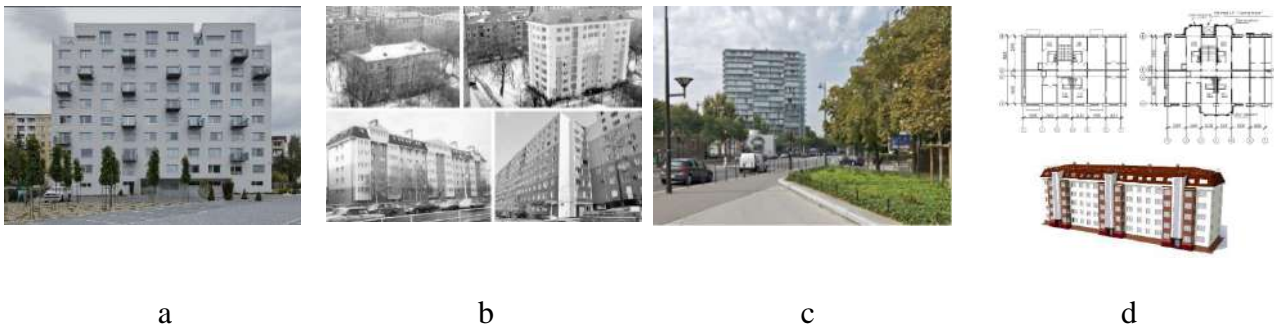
Examples of densification of buildings: a) prefabricated house in Rimavska Sobota, Slovakia 2014 [4], b) reconstruction of a residential building, Surgut, Russia 2017[5], c) transformation of the Bois-le-Pretre tower, Paris, France 2014 [6]; (d) reconstruction of a residential building in the city of Irkutsk, Russia 2018. [7].
